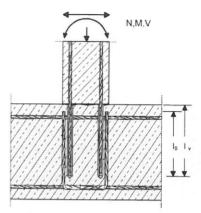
Overlap joint at a foundation of a column or wall where the rebars are stressed in tension
